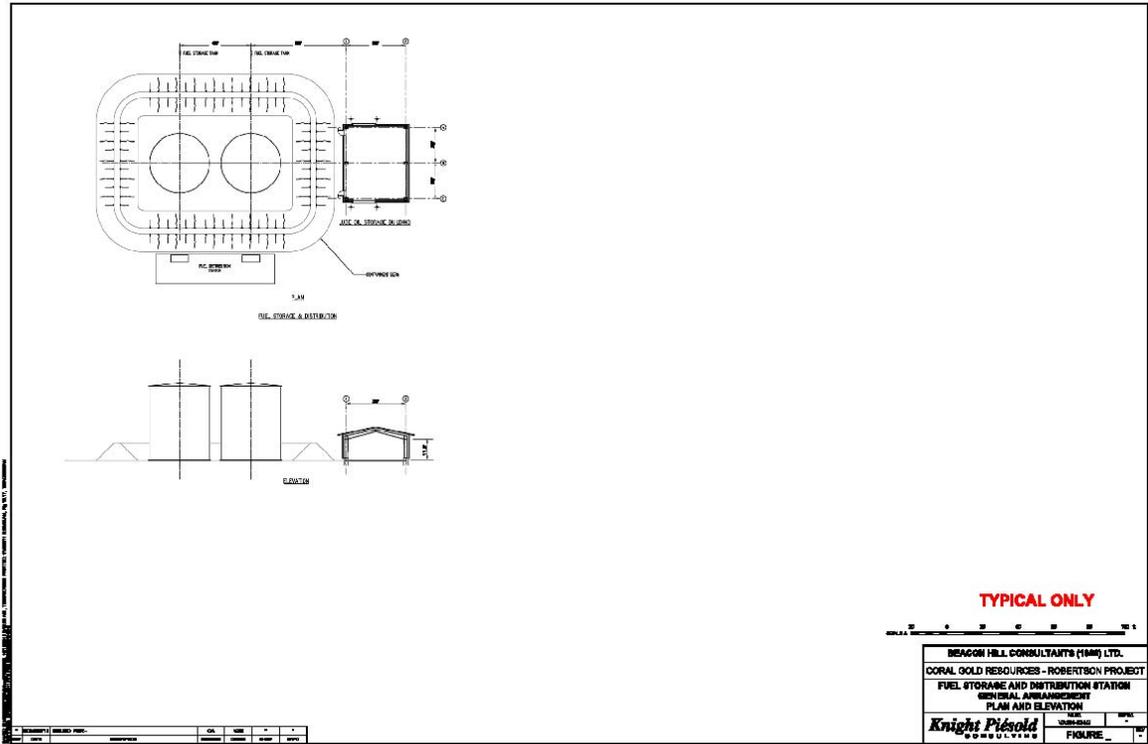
Fuel Storage and Distribution Station – General Arrangement Plan and Elevation
